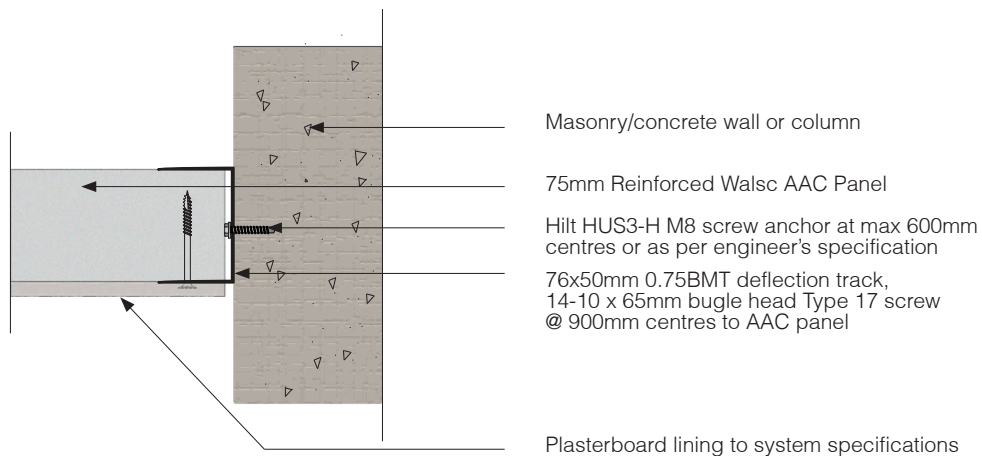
Service Shaft Wall Option 1 Column Fixed Joint Detail
